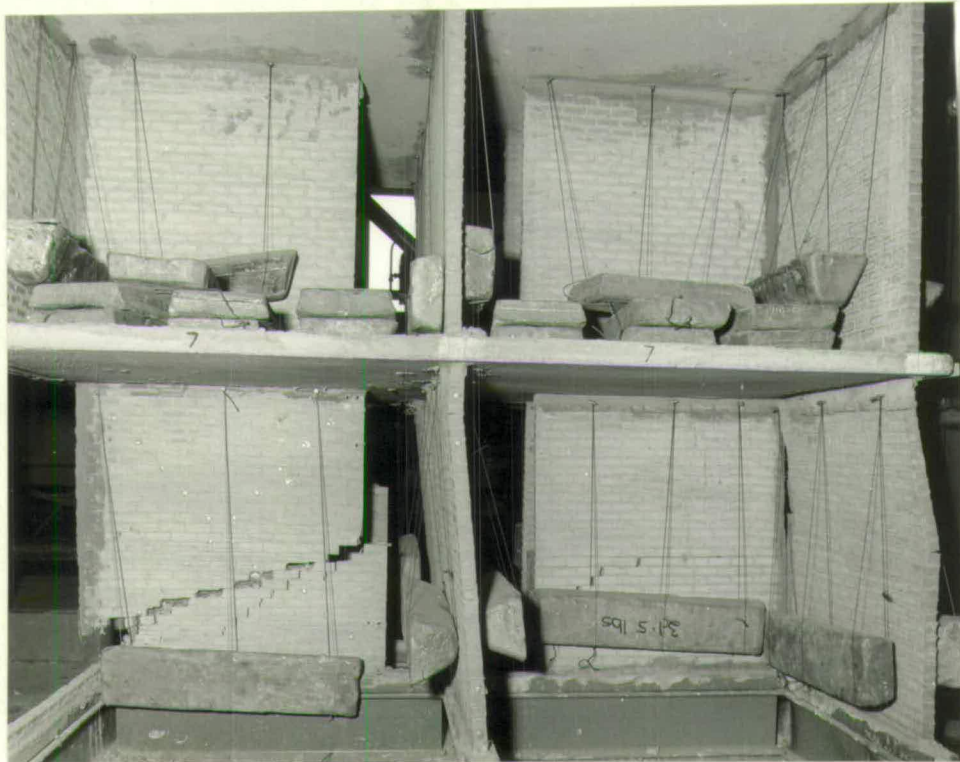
Showing the failure of Shear walls (2 Nos.) in first storey.
